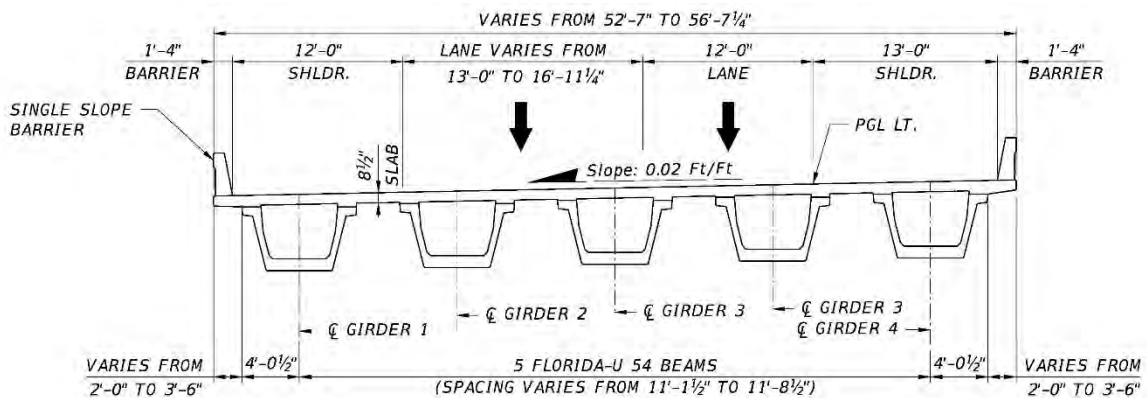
Bridge #16 Typical Section (Spans 1 & 2)
